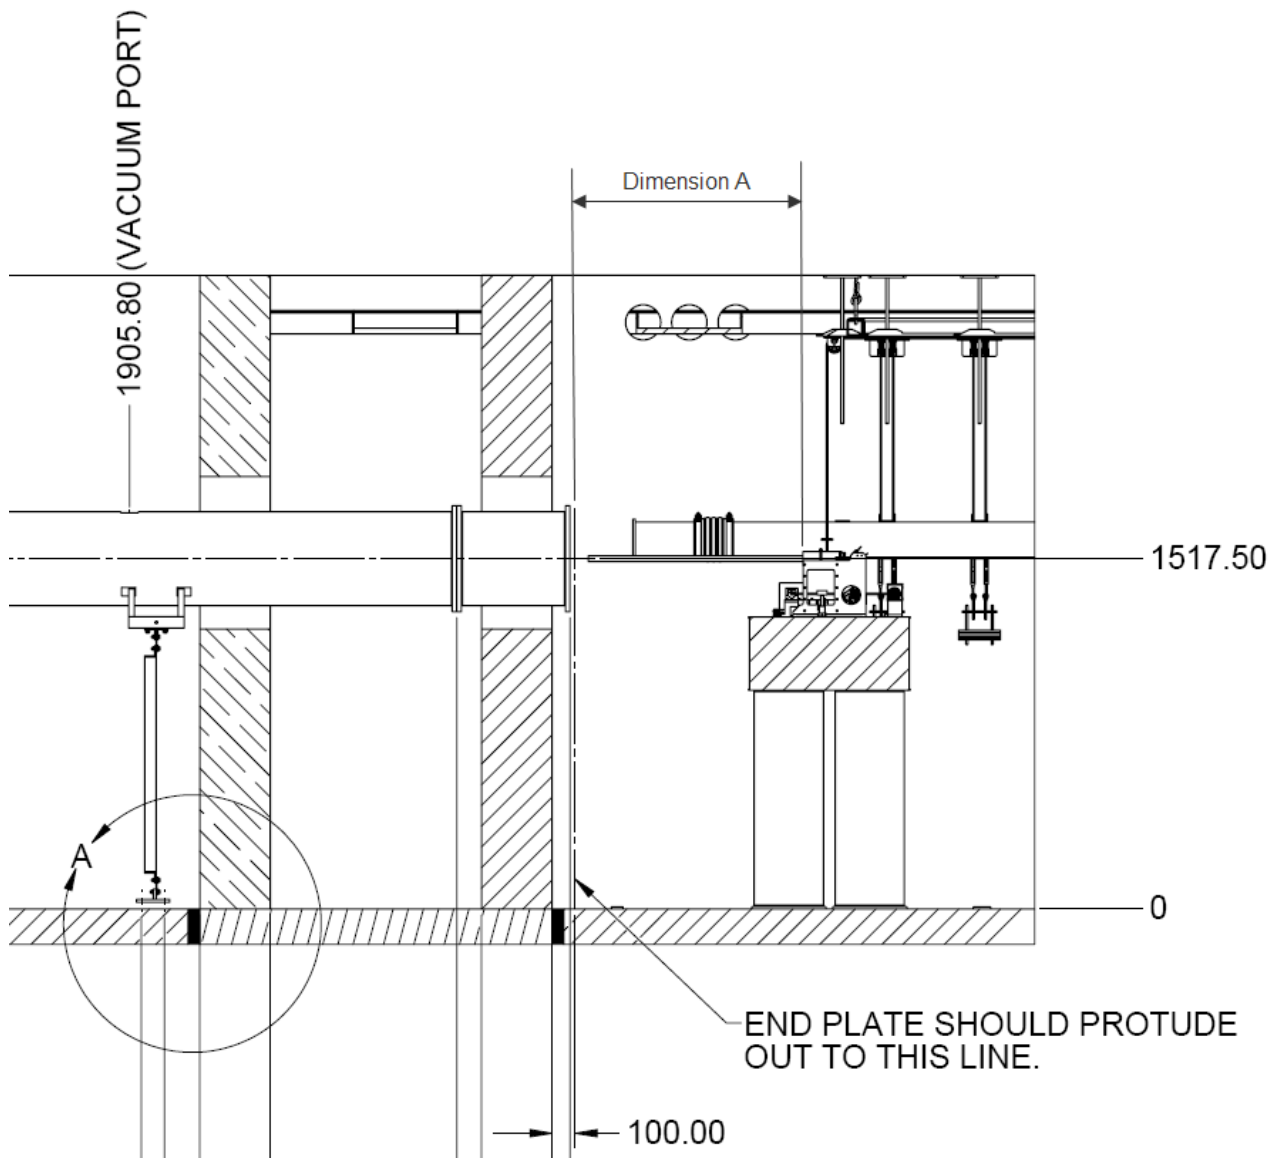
Extract of metrology layout showing the dimension A between the end-plate of the delay line and the beam expander blocks mounted on the metrology bench. Dimension A is not to be less than 1m.
